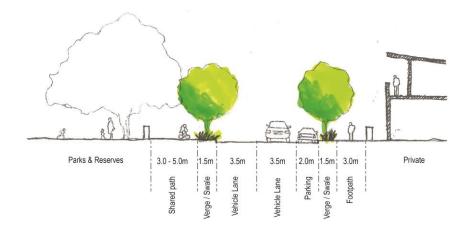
Provide open spaces overlooked by streets and dwellings, to improve safety and encourage use of open spaces
